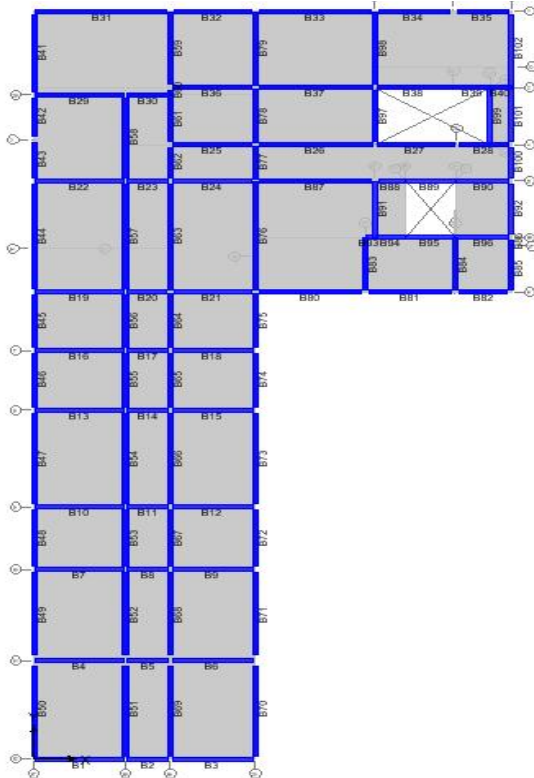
PLAN OF THE BUILDING CONSIDERED IN CASE STUDY5.
